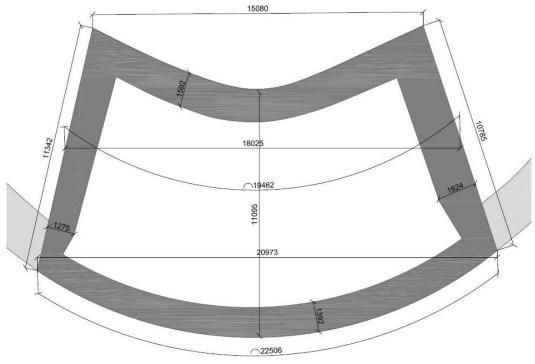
A floorplan based on traced old drawings. Dimensions are current sizes. Source: own ill.
